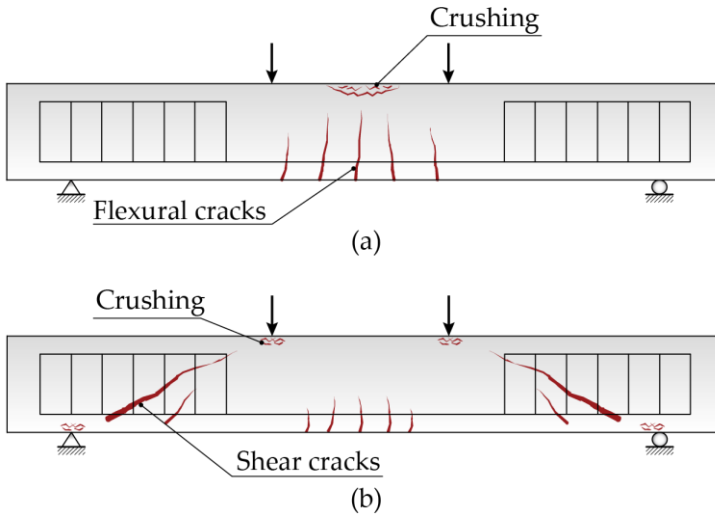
Schematic representation of the failure modes in a reinforced concrete beam: (a) flexural and (b) shear failure mode.
